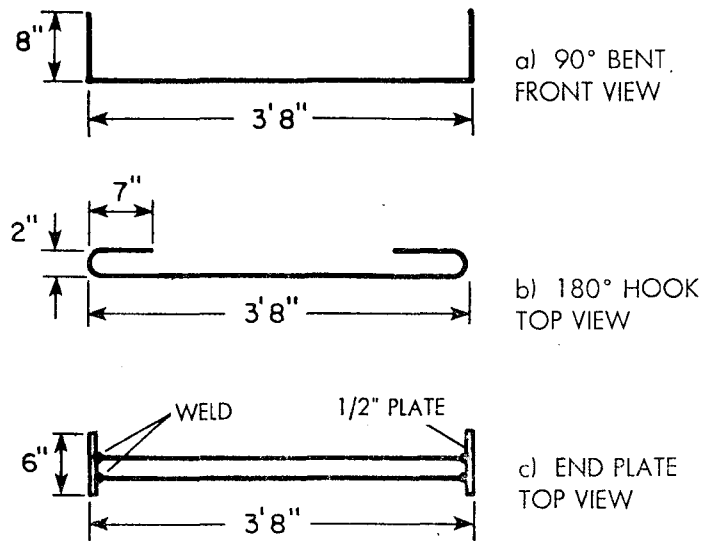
TYPES OF ANCHORAGE OF HORIZONTAL BARS
